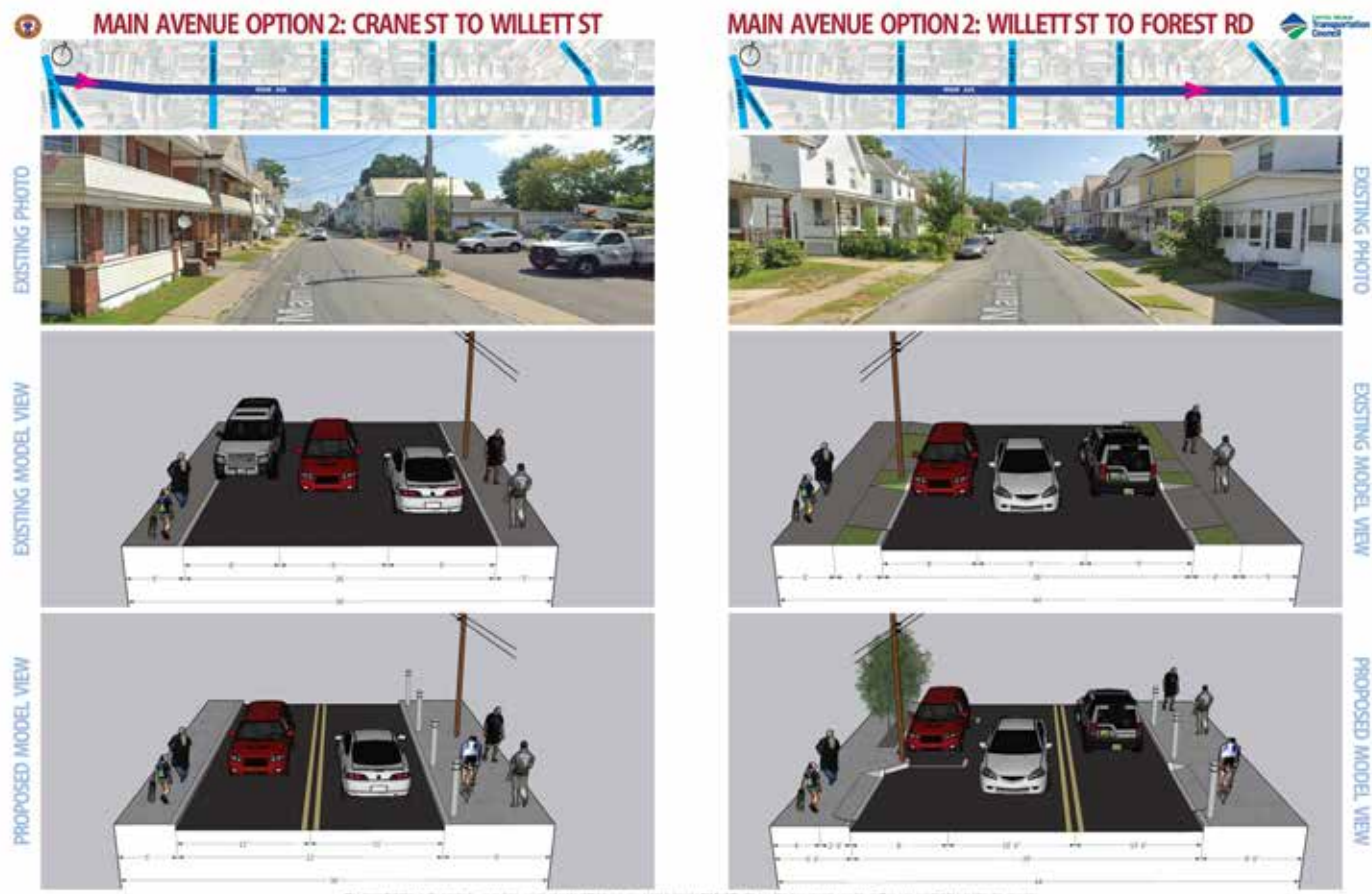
Main Avenue Concept 2 Cross-sections
